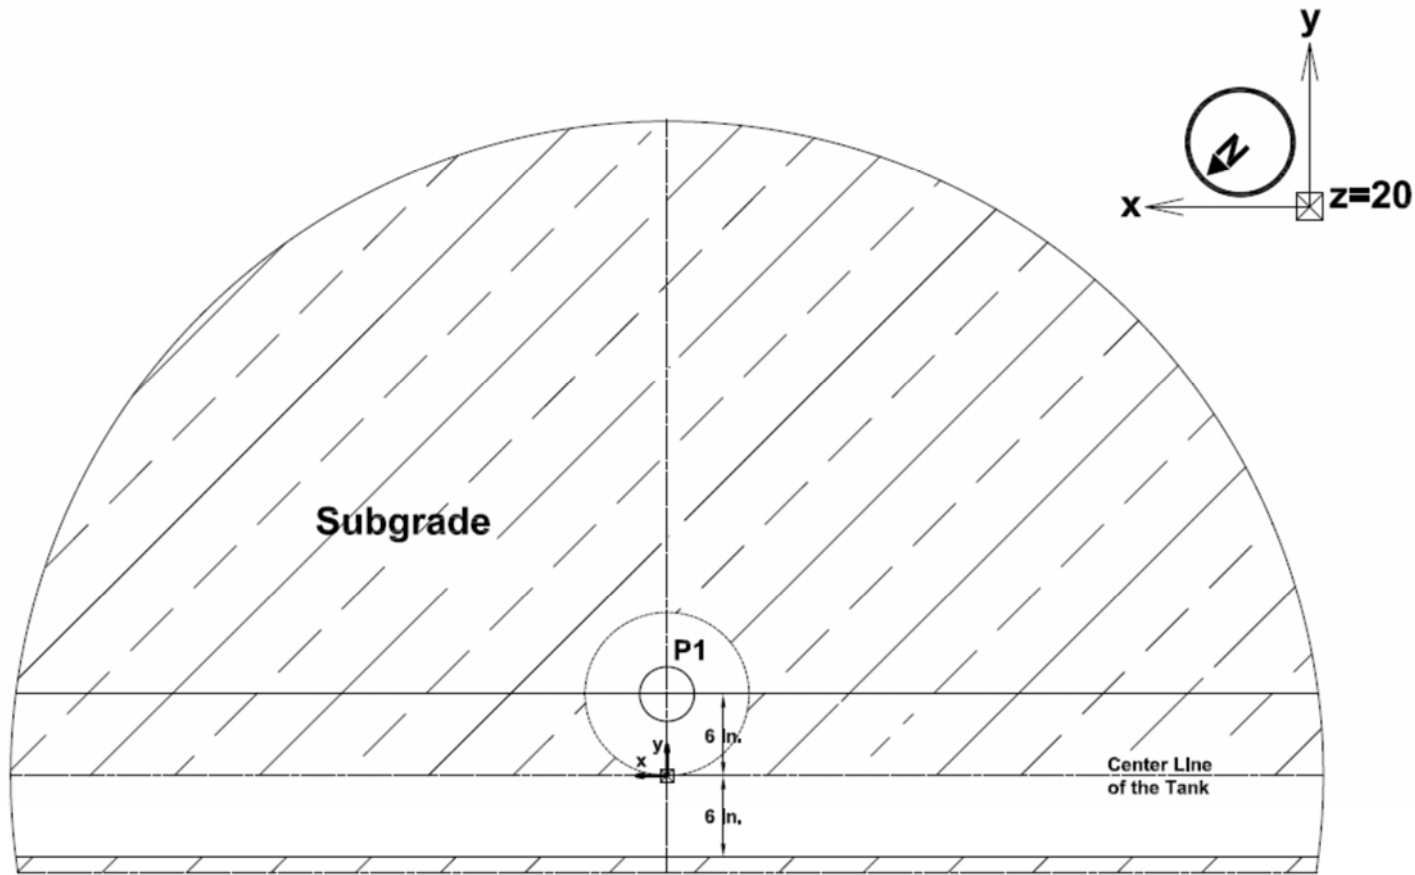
Instrumentation plan for experiment No. 7—Plan view, $Z=20$ inches
